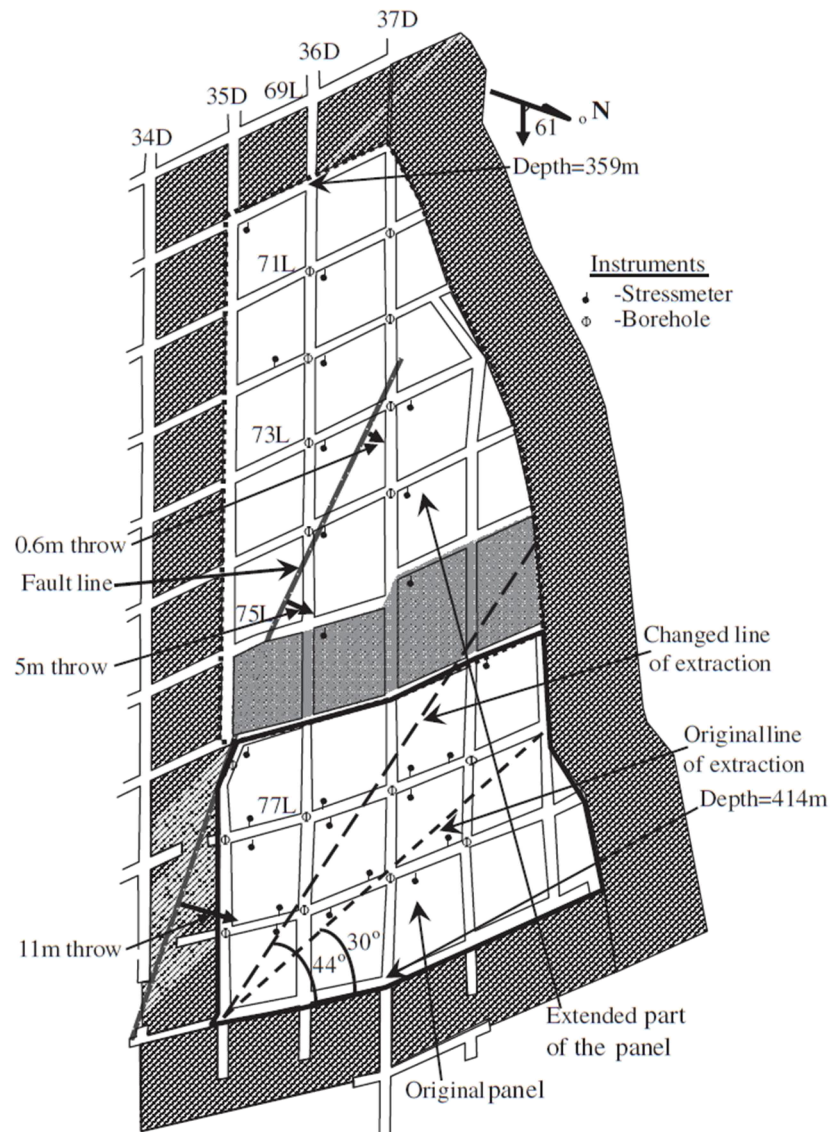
Original and modified panel plan on VK-7 incline Singh et al. (2011)
